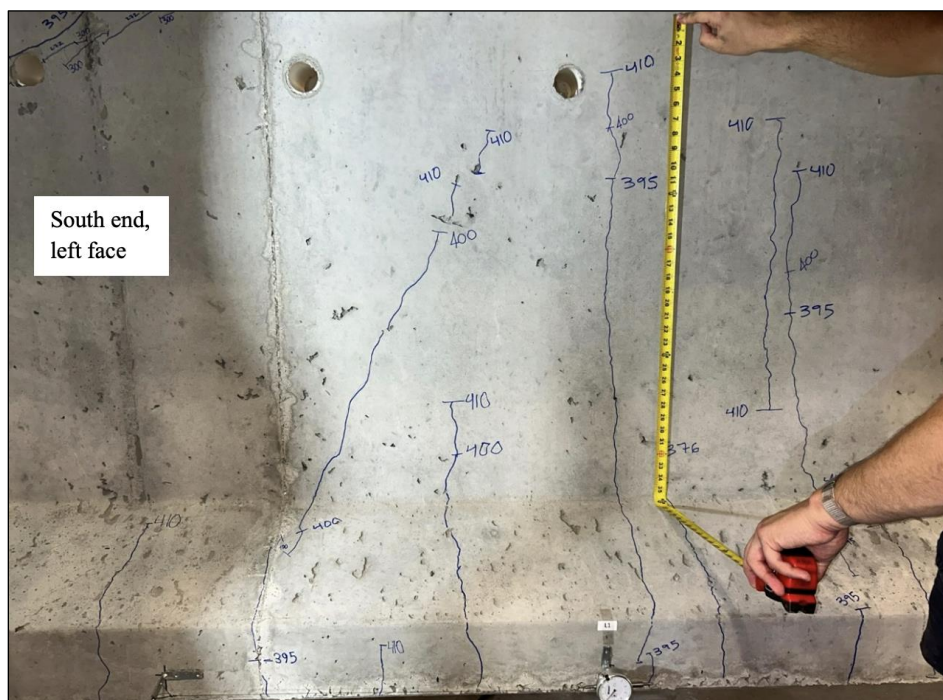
Photo. Test 3.2.S (repair 3.2RBF) shear-flexural cracks located directly under load point at 410 kip (left face of girder pictured).
